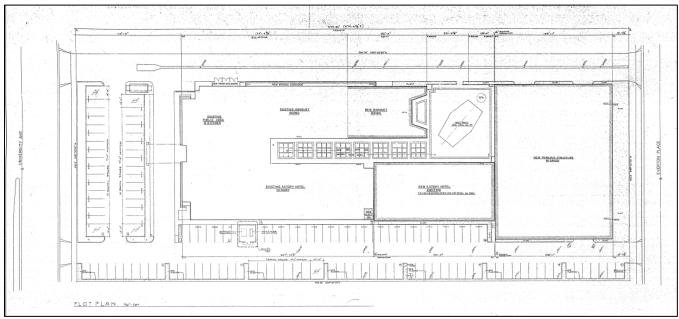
Altered site plan of 1200 University Avenue, 1984 (Rissman & Rissman Associates)
